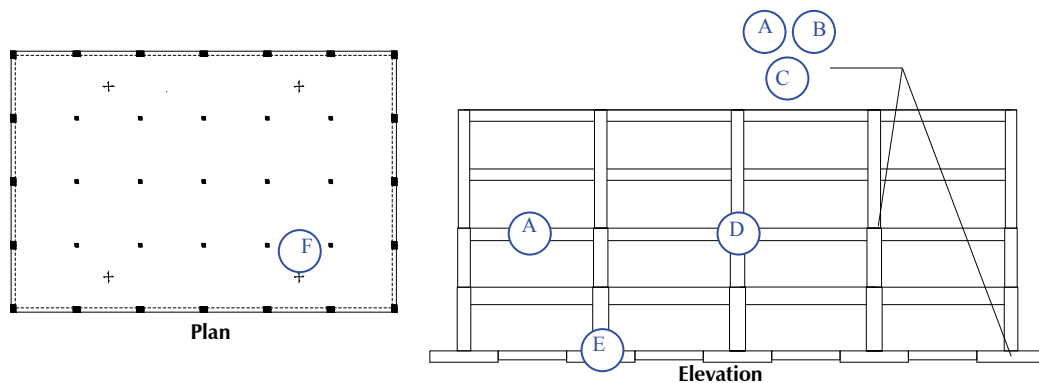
Reinforced concrete frame plan and elevation views, showing location of possible deterioration modes.
